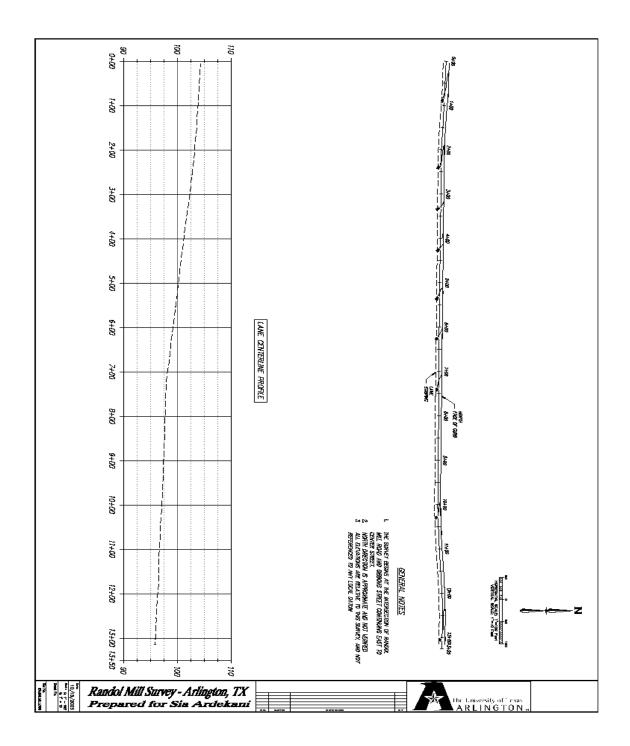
Longitudinal Grade for Randol Mill Road (AC) in Arlington, TX.
